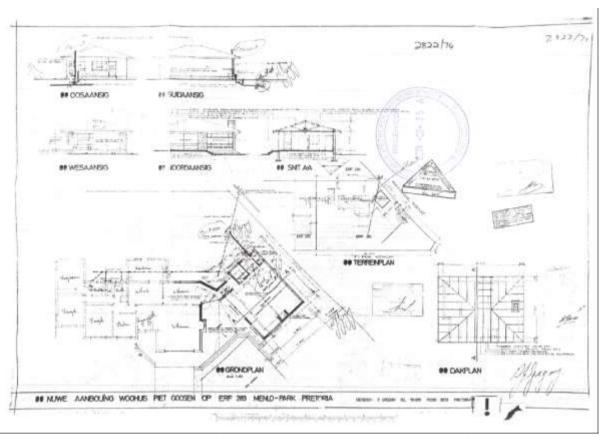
1974 Building Plans for proposed alterations to the Piet Goosen homestead.
